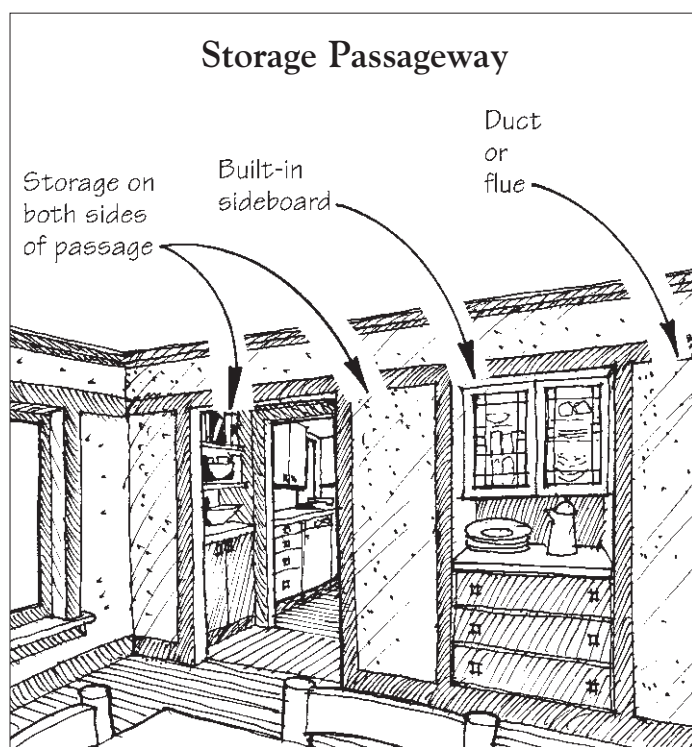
Two walls built 3 feet apart separate the dining room from the kitchen. Between the walls are storage units on both sides of the passage, a built-in sideboard, and space for a duct, flue, or possibly a basement stair. The "double door" passage makes a nice transition between rooms.
